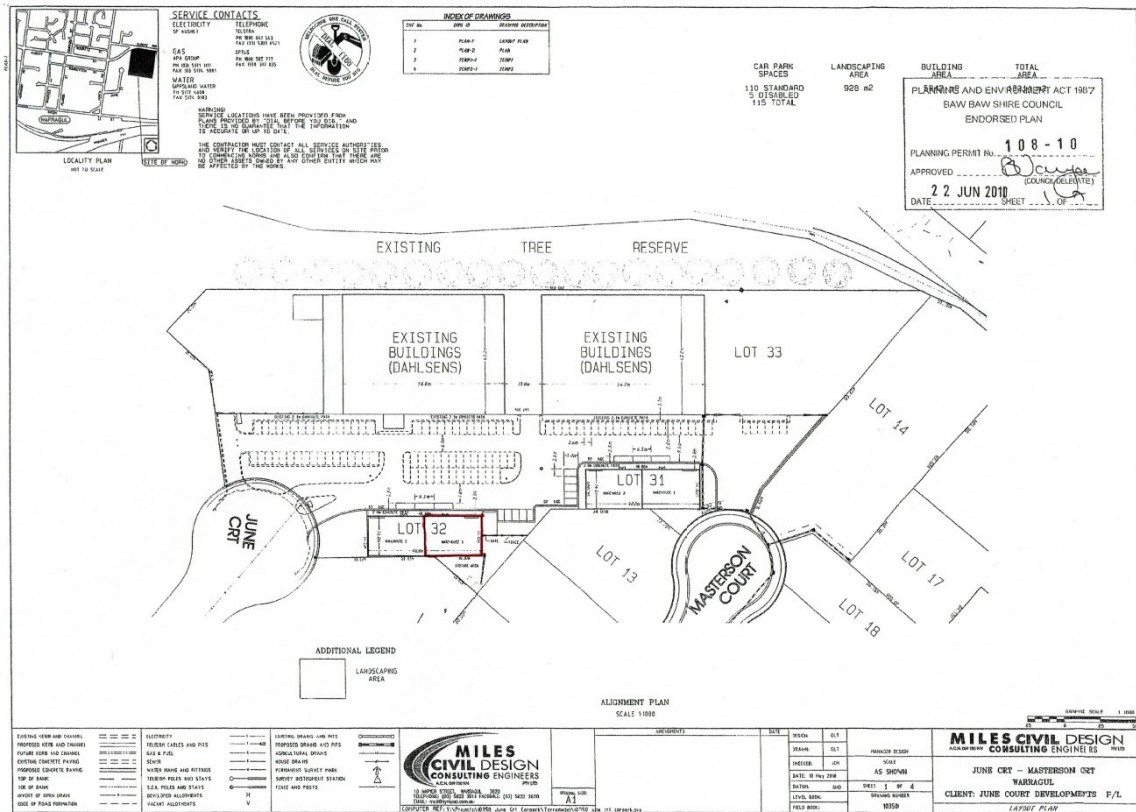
Endorsed Site Layout Plan for Planning Permit 108-10 for which the subject unit forms part.
